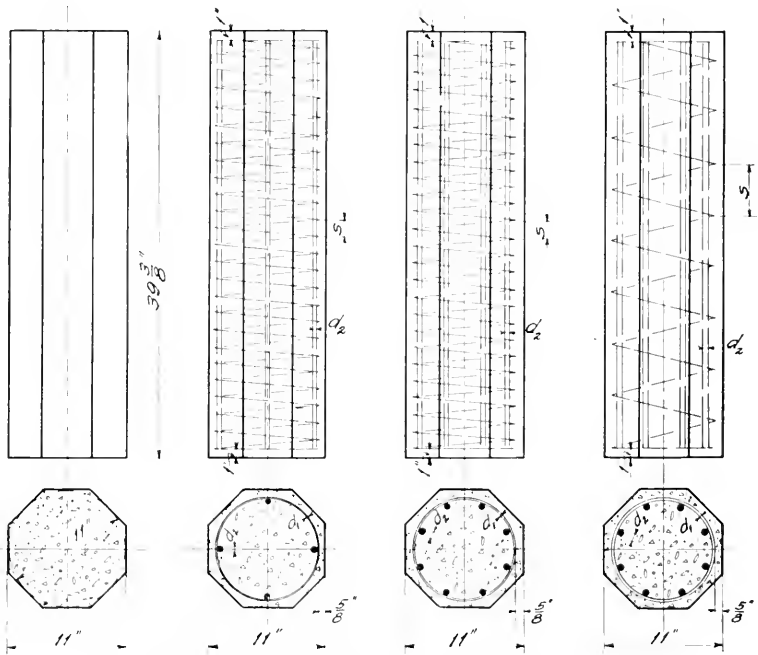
Dimensions of Columns and Type of Reinforcement.
